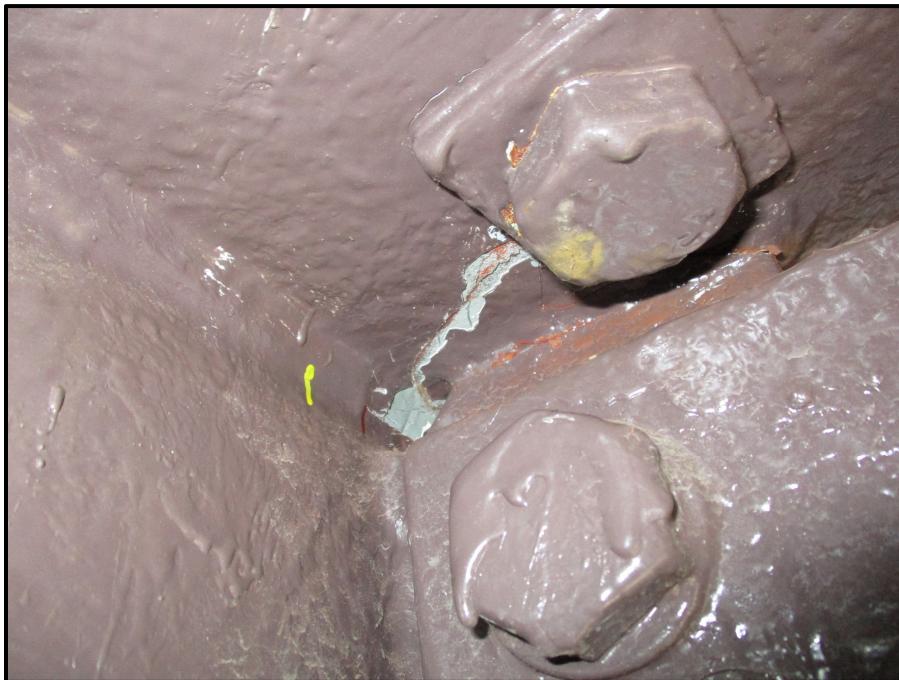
Span S1, Floorbeam 4S at Stringer 14N - Previously noted partially cracked web stiffener top weld and distressed paint along the lower toe of the web-to-upper flange weld on the north face of the floorbeam now exhibits a completely broken weld and a 2-1/2" L crack on the web, east side of the stiffener, looking southwest. Note the broken weld includes a small, thin portion of the underside of the flange along the apparent heat affected zone.
